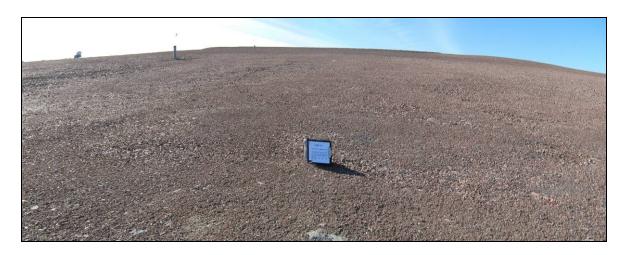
A. Facing north along crest from southeast corner. \uparrow
